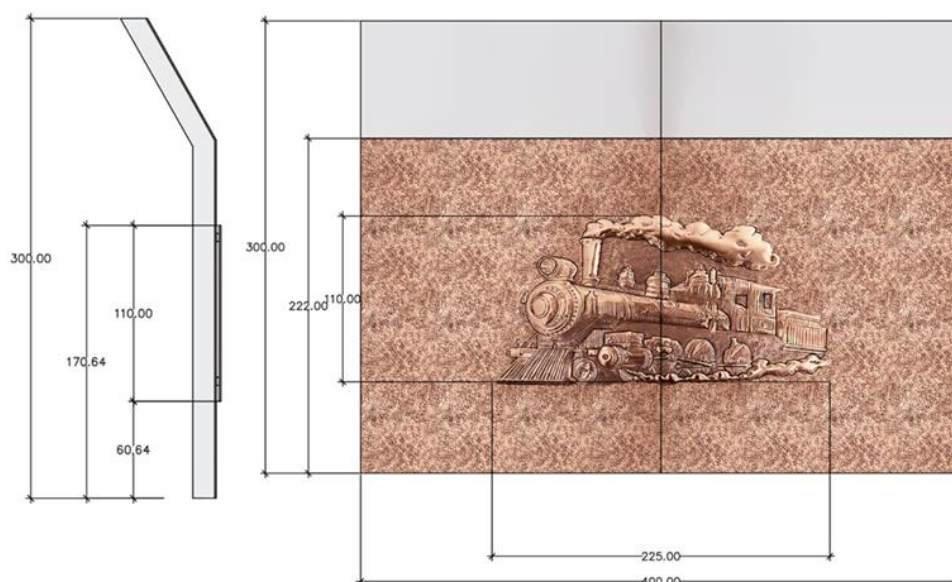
Cross-section, transverse, and longitudinal profiles of noise protection panels in residential areas
